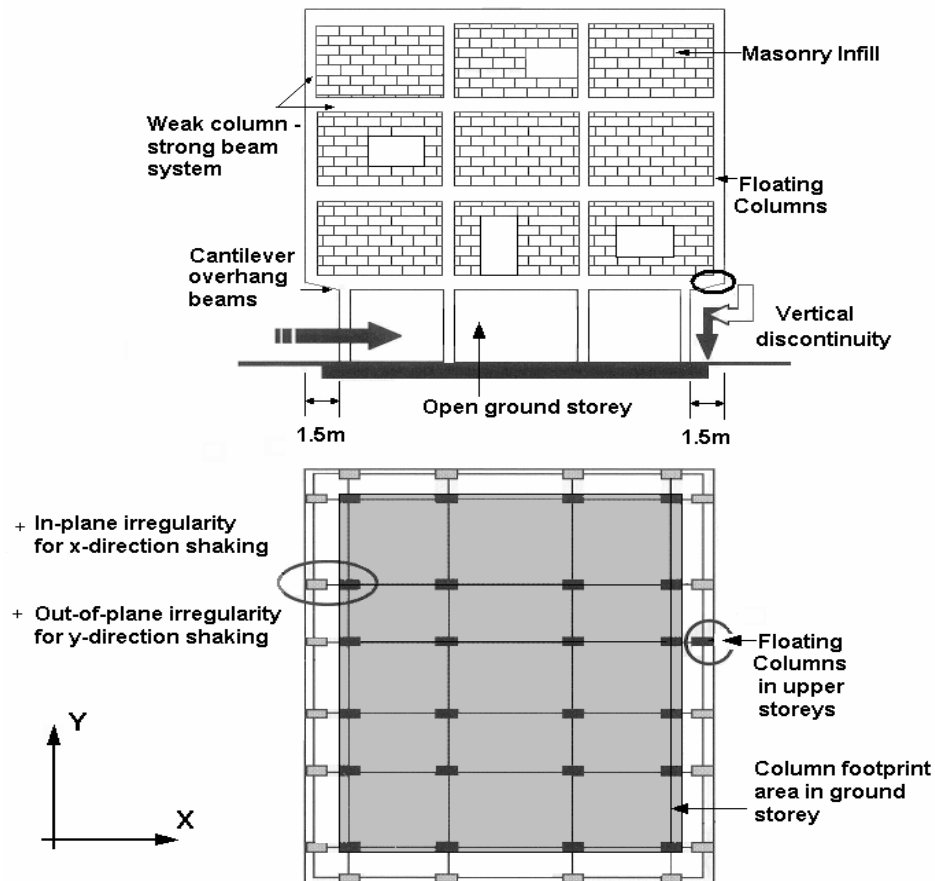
Typical building elevation and plan showing plan and vertical irregularities (Murty et al., 2002)
